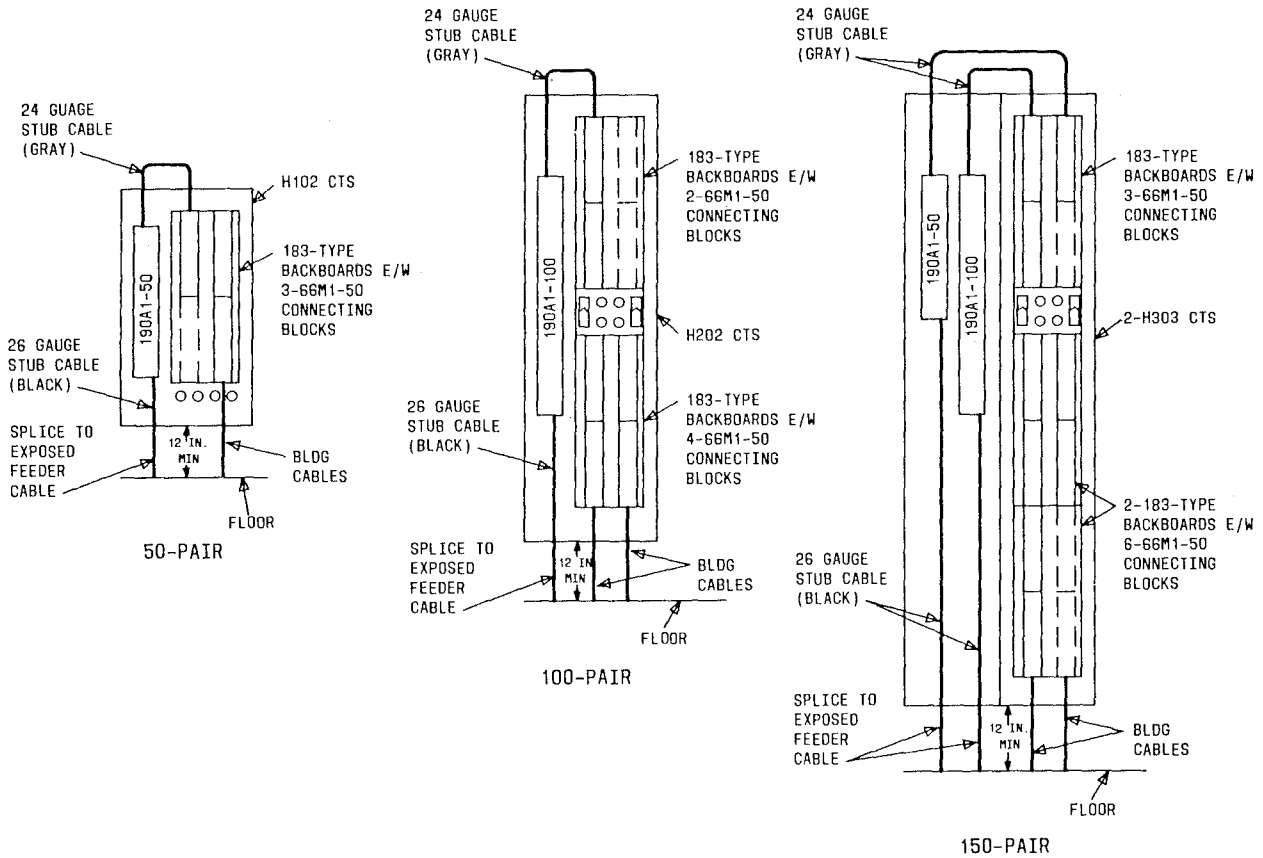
50-, 100-, and 150-Pair Exposed Entrance Cable—66-Type Connecting Blocks
